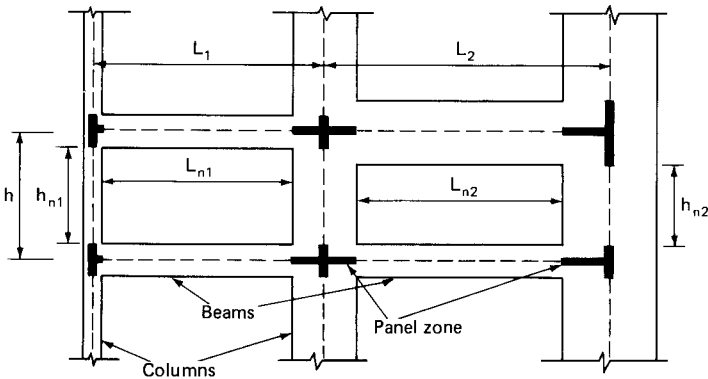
Typical beam-column joint with infinitely rigid panel zone.
